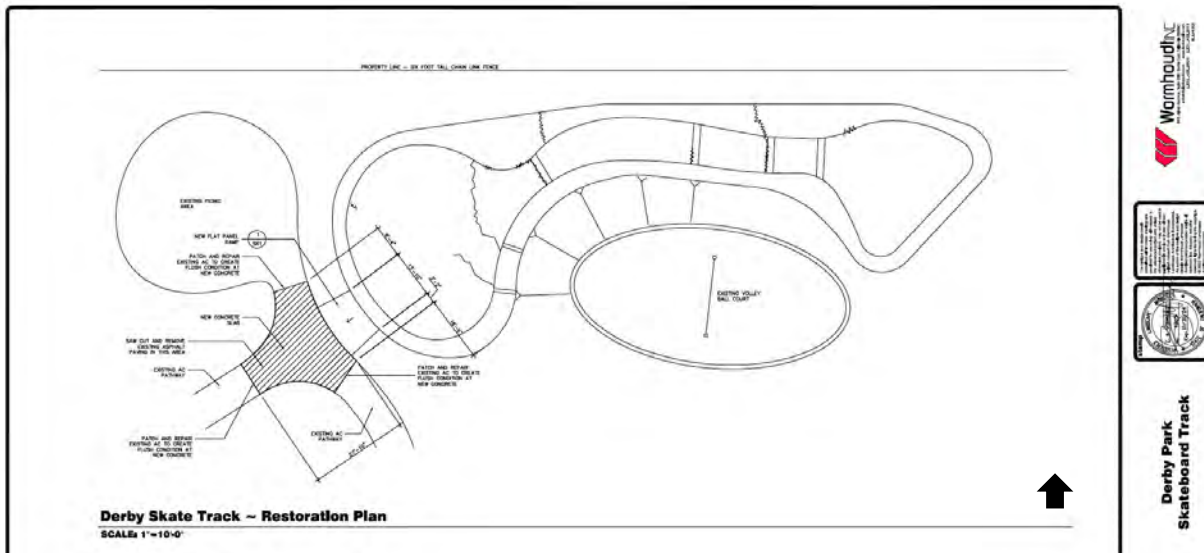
2004 Wormhoudt Inc. maintenance plan, addition, north arrow added (Wormhoudt Inc. files)
